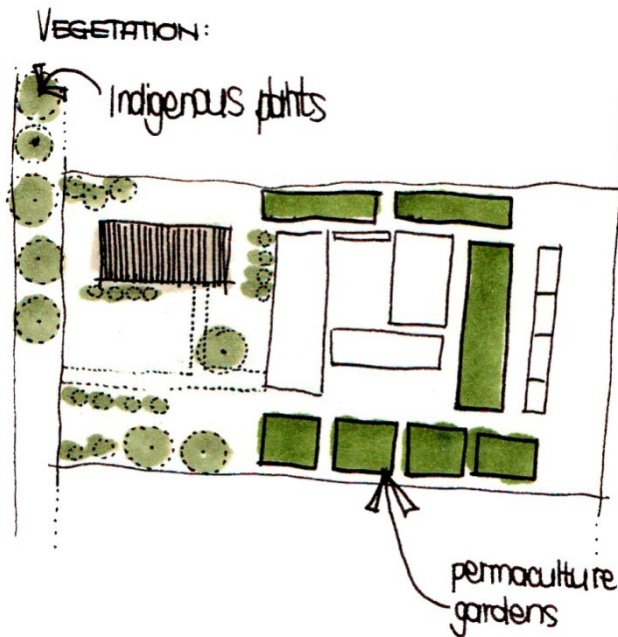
Site plan illustrating the garden layout including permaculture and vegetable gardens
